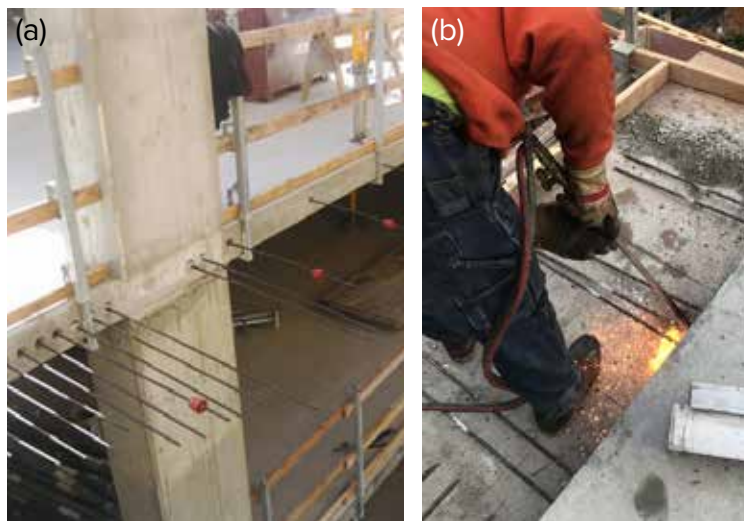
PT strand tails must be cut to allow protective systems to be installed at the anchors: (a) strand tails extending from a PT slab (image courtesy of PTI); and (b) a worker cuts a tail using an acetylene torch (image courtesy of Conco).
